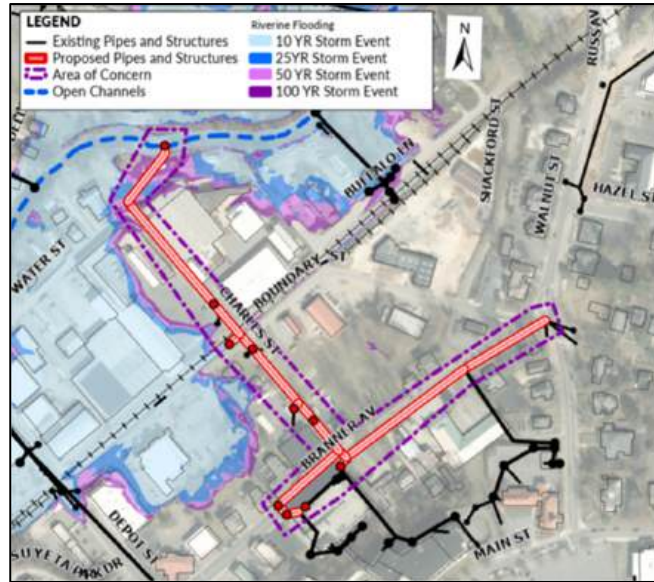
Concept Project Area 4 – Charles Street and Branner Avenue
